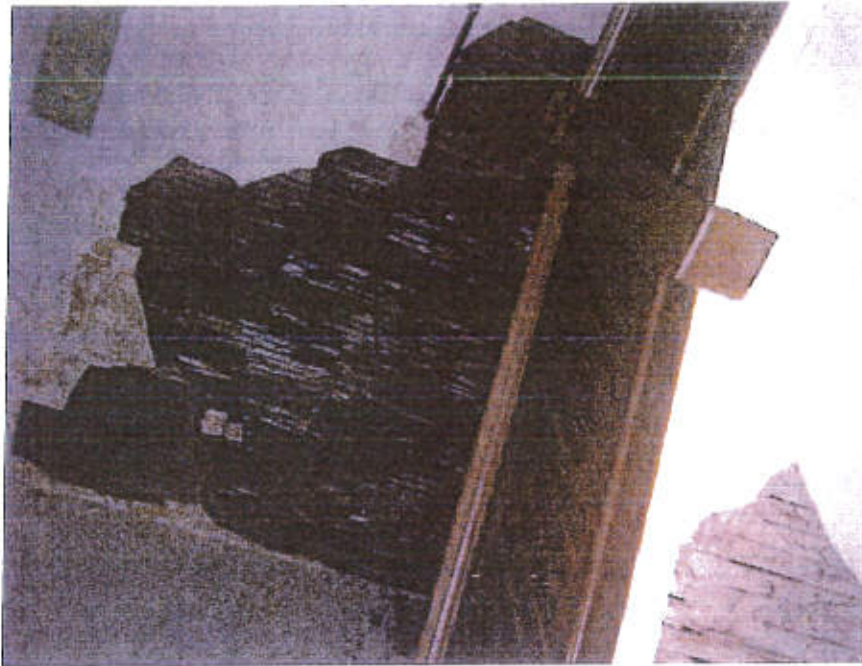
Water Damage in Upper Level Ceiling Above Stairs
